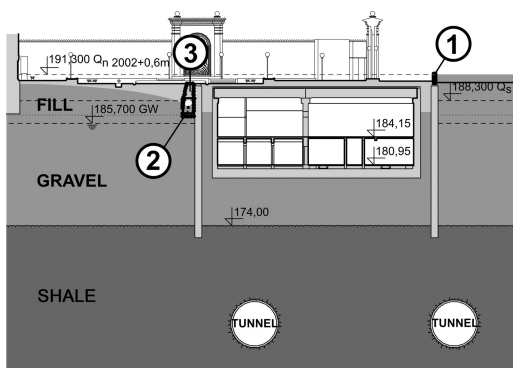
The drainage system along the concourse of Malostranská metro station. 1. Mobile barriers, 2. Drainage gallery, 3. Dewatering pump.
